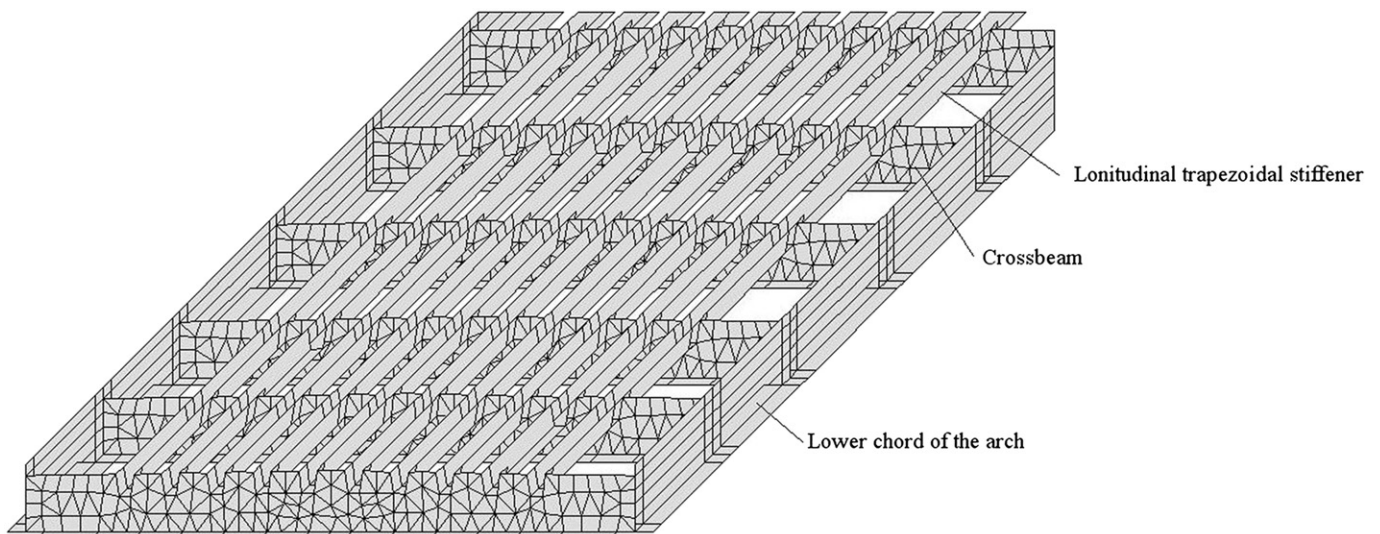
Detail of the bridge deck in the finite element model of the Albert Canal Bridge.
